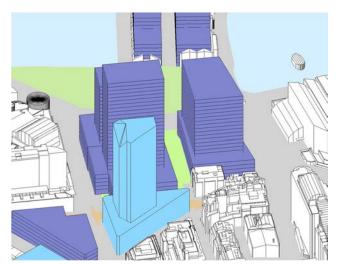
location plan of 2 Edward Street & 60 Union Street
